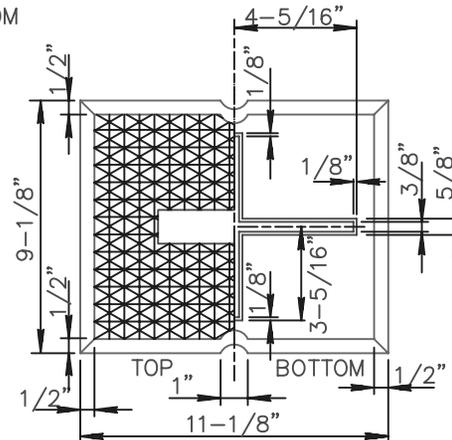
STANDARD DETAIL	CAST IRON OR DIAMOND PLATE STEEL WATER METER BOX COVER NO. 4	CITY OF KINGMAN	N.T.S. DETAIL NO. 313
